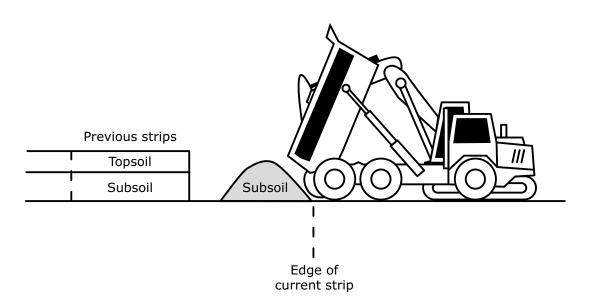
Soil replacement with excavators - dump trucks: Subsoil layer.
